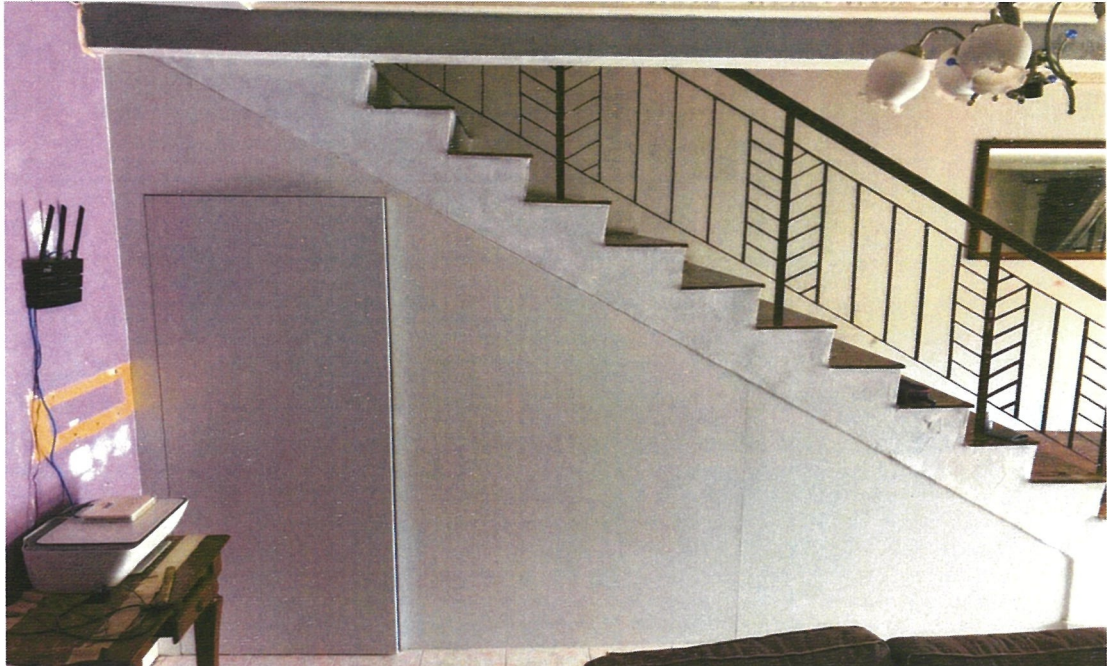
INSTALLATION DOOR UNDER THE STAIRS
